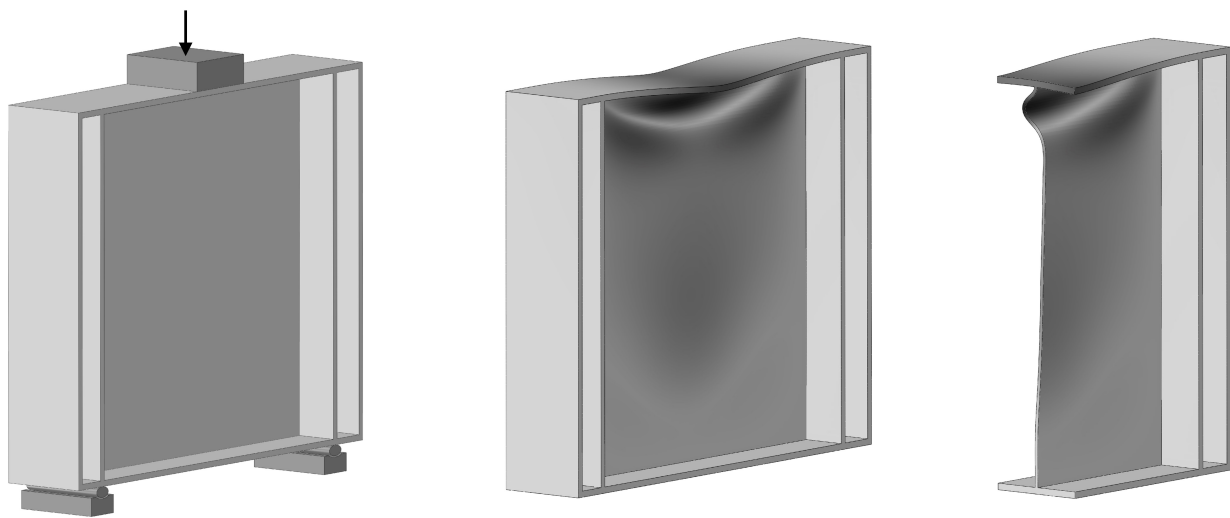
A thin-walled plate girder subjected to localized edge load (patch loading) and typical failure mode
